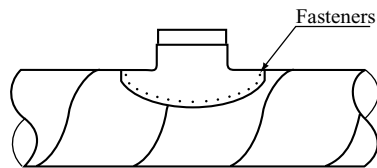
Saddle tap with spot-welds or fasteners.
